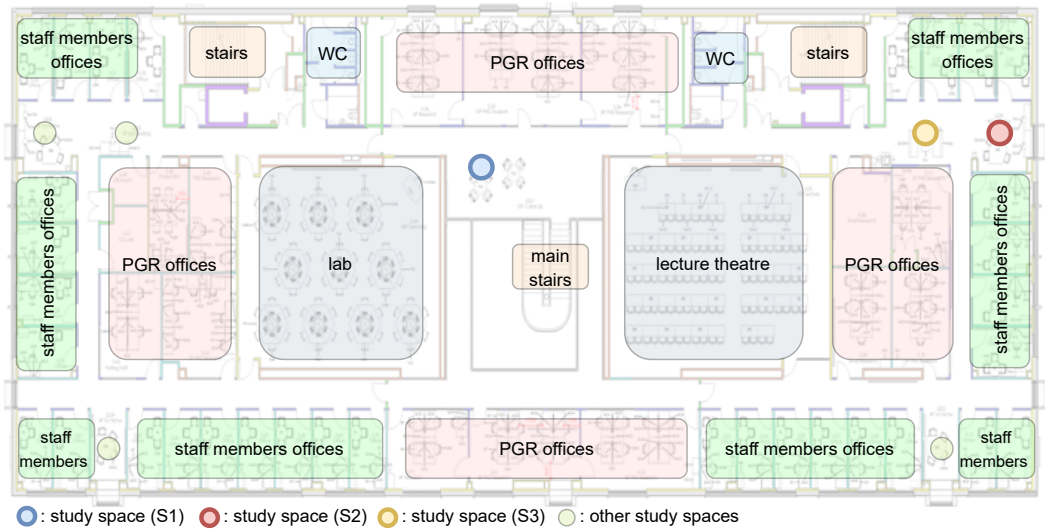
The floor plan of the fifth floor of the building with selected study spaces.
